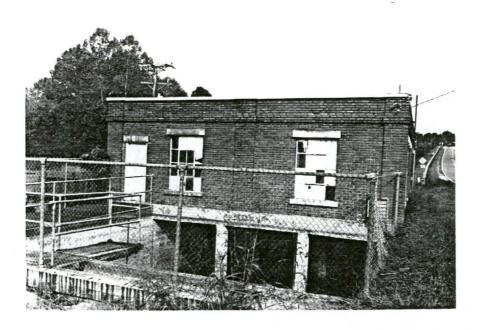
Water Treatment Plant, East Elevation, Looking West.
